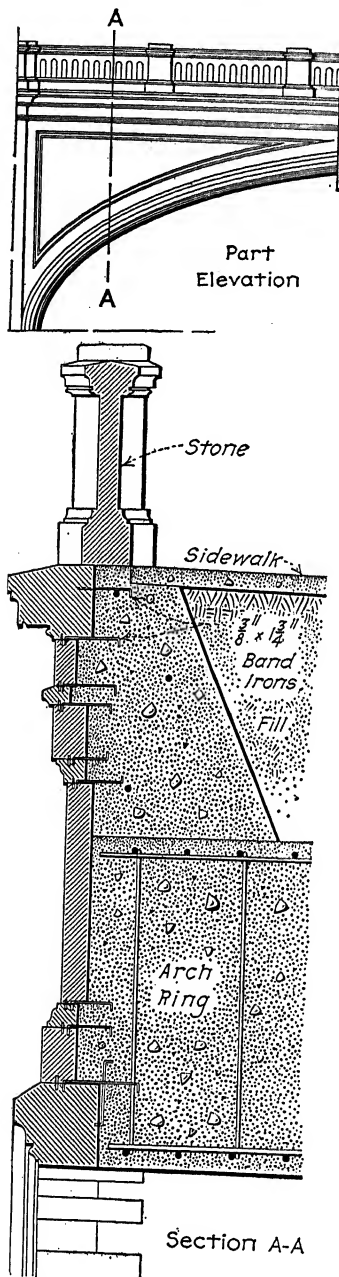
Details of stone facing of Michigan Street bridge over St. Joseph River, South Bend, Ind.
